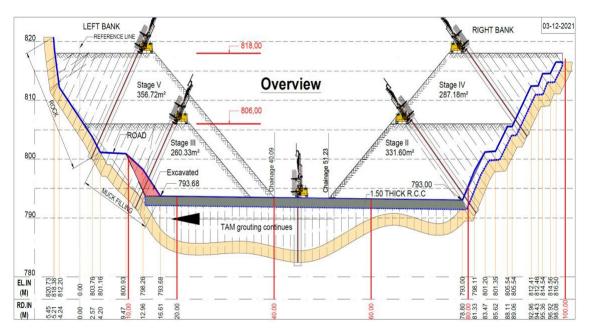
Typical cross section of upstream coffer dam with grouting scheme geological condition
